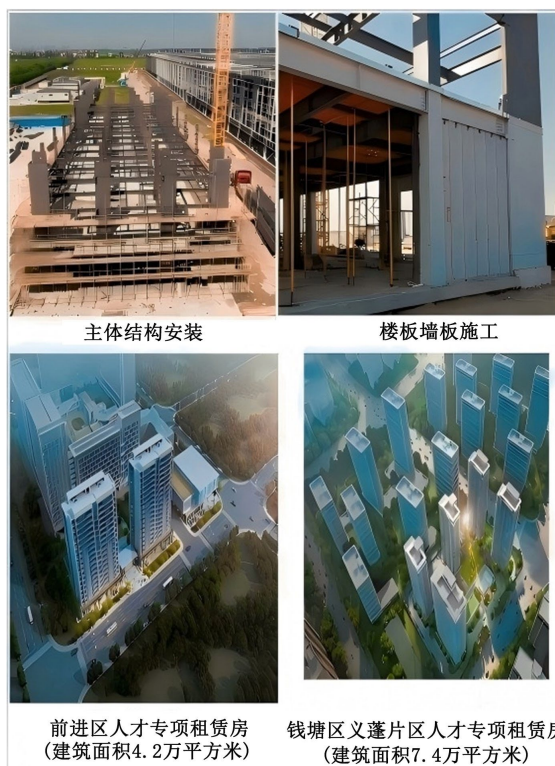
Engineering case of truss stiffened multi-cavity steel plate composite shear wall
